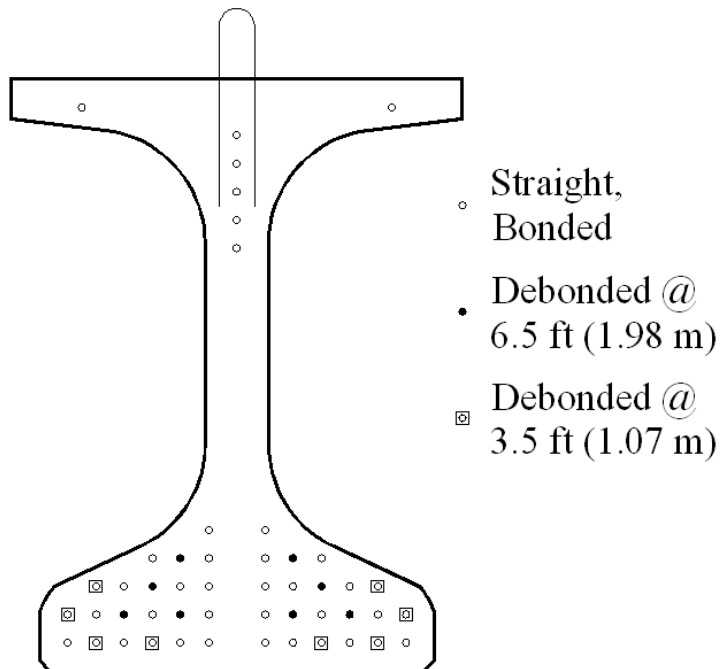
Strand Layout and Mild Steel Reinforcement of the Modified BTCIO Girder.
